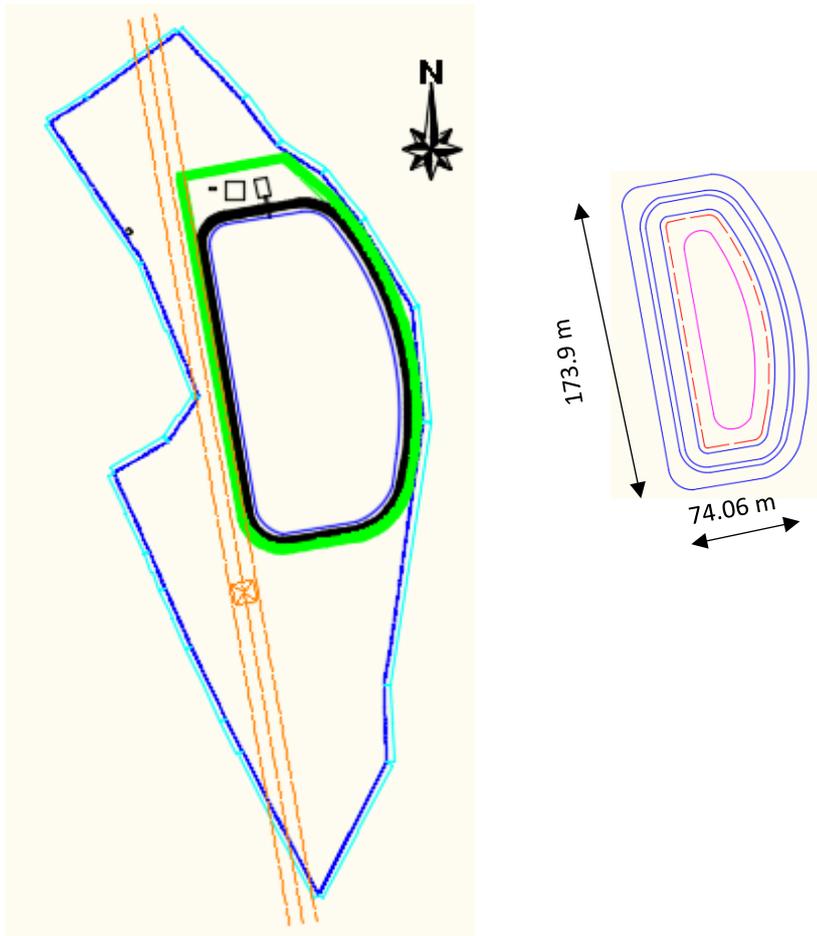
Layout and plan of Case 2a Landfill within AoC3
